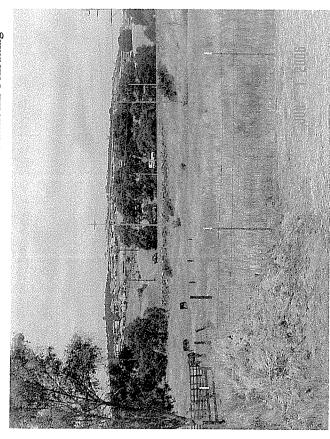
Lot 13 – Tong Ranch LLC; looking west at embankment fill of SR50, from dead-end of White Rock Road.
